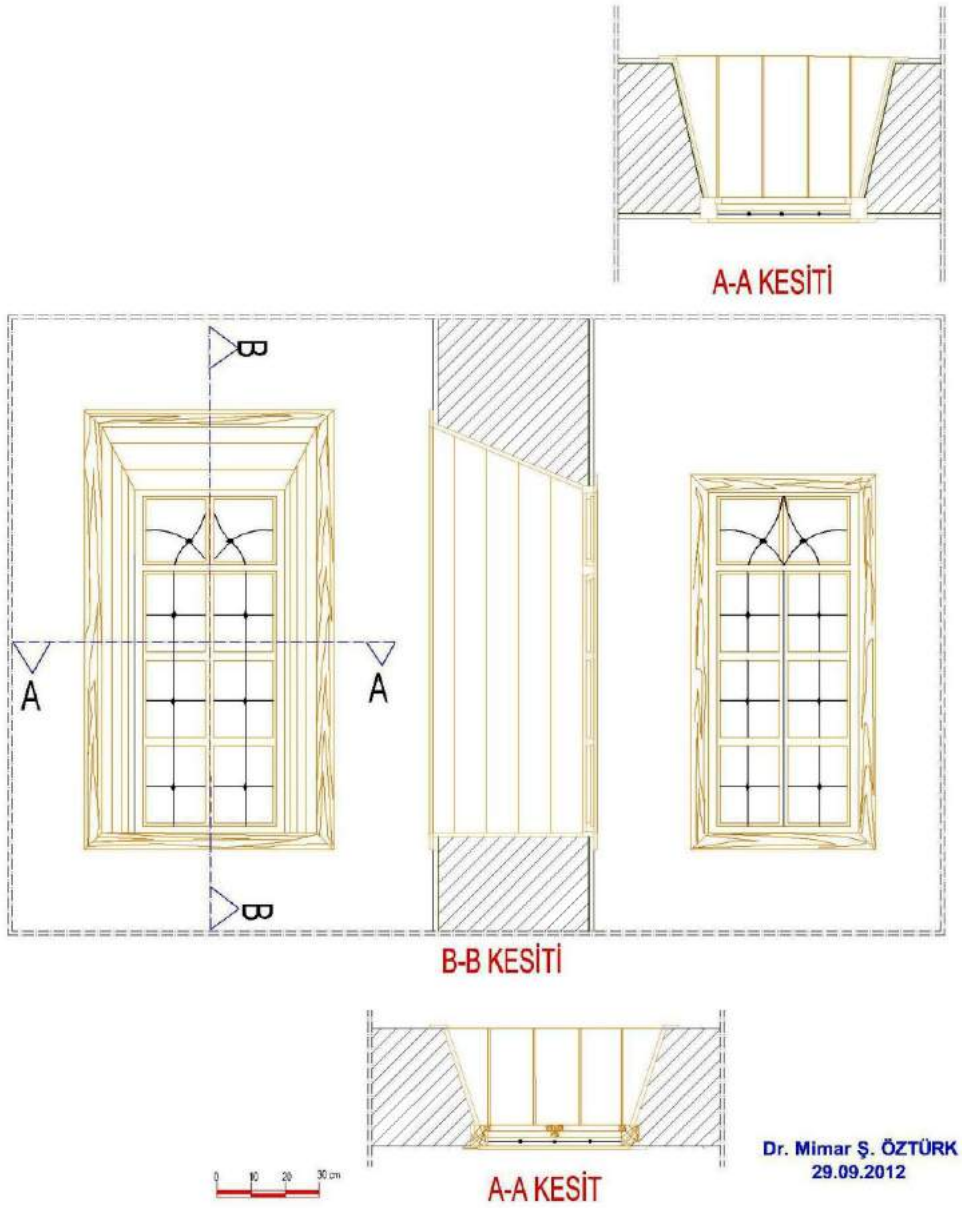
Polat Yörükoğlu House Window Details, drawn by author.
